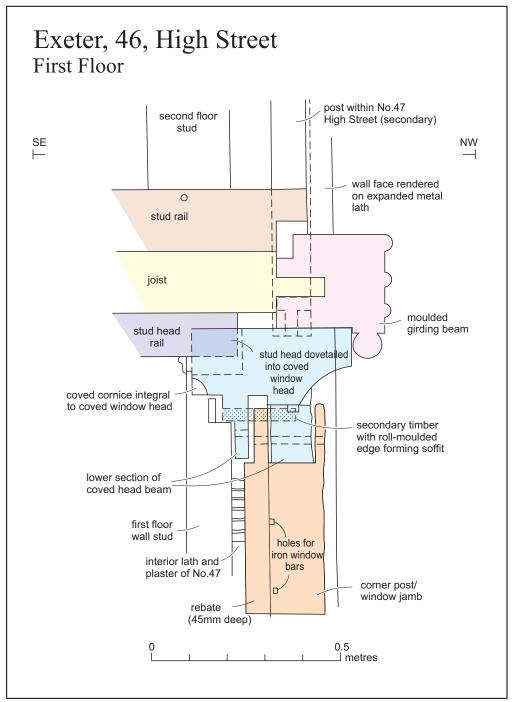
Section diagram through the front façade at the west end showing the timber construction. Scale 1:10.
